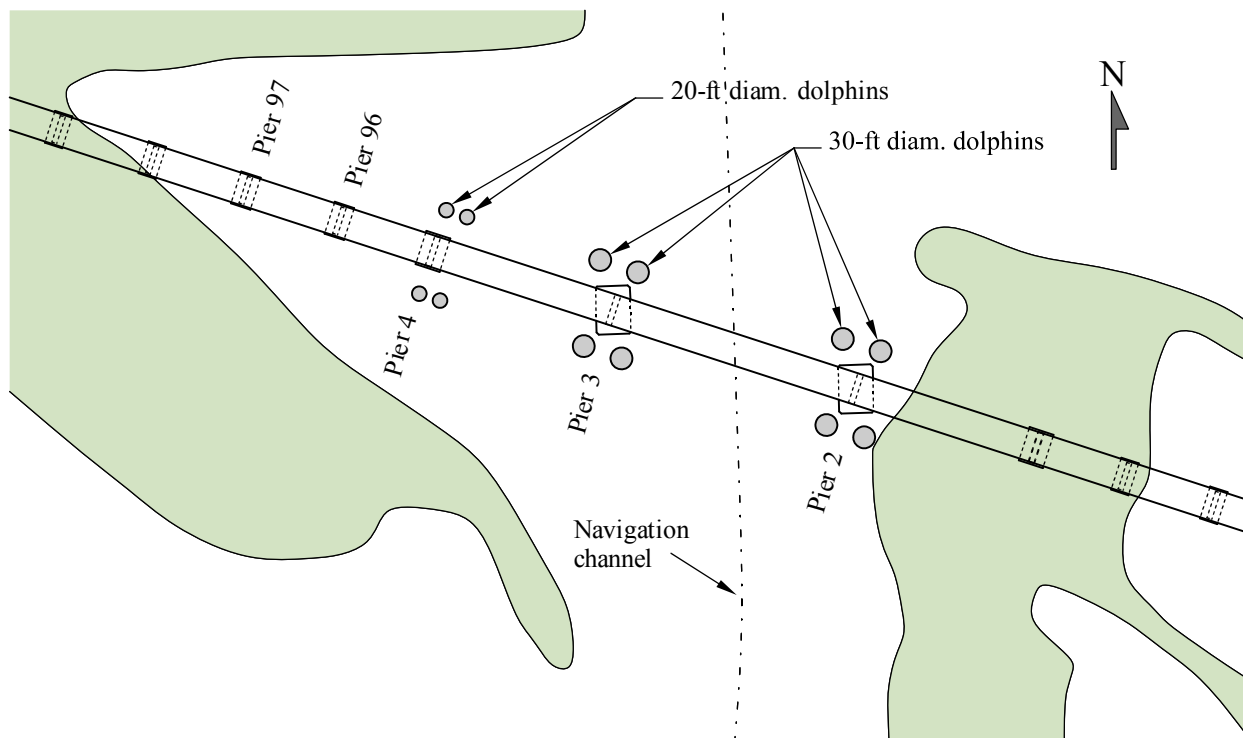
Plan view of LA-1 Bridge showing locations of protective dolphin structures
